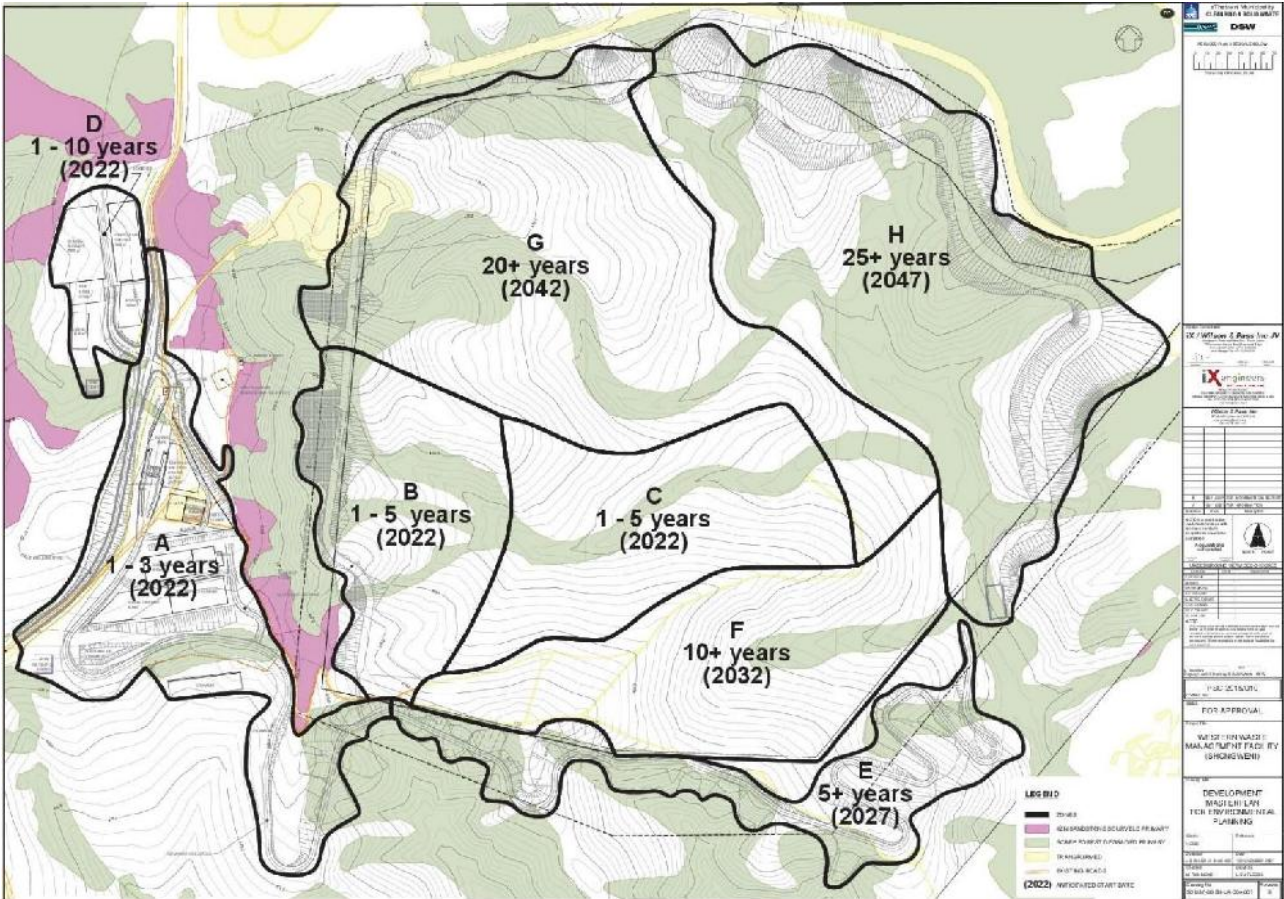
WWMF landfill site development plan Revision B (iX Engineers, 2021).
